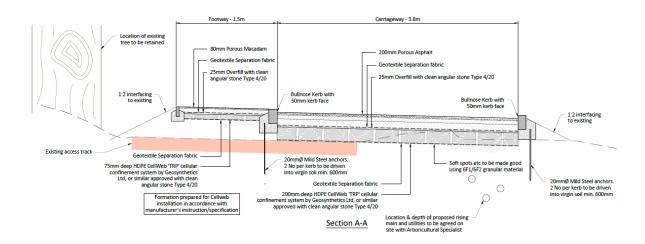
Extract of cross-sections prepared by Structa for proposed road next to tree T15.
